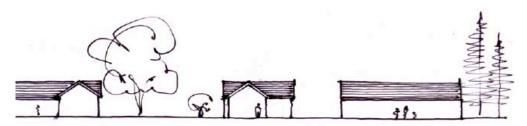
Elevation illustrating consistent one-story building height that does not provide interest in the landscape and is not recommended for the rural landscape.
